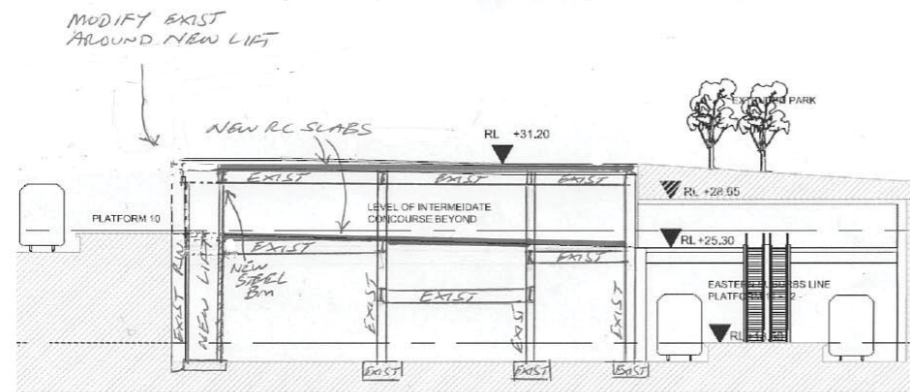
Typical section through concourse linking Platform 10 to Platforms 11/12
